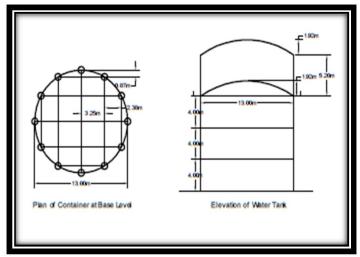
Plan and Elevation of Cylindrical with top and Bottom Dome Tank
